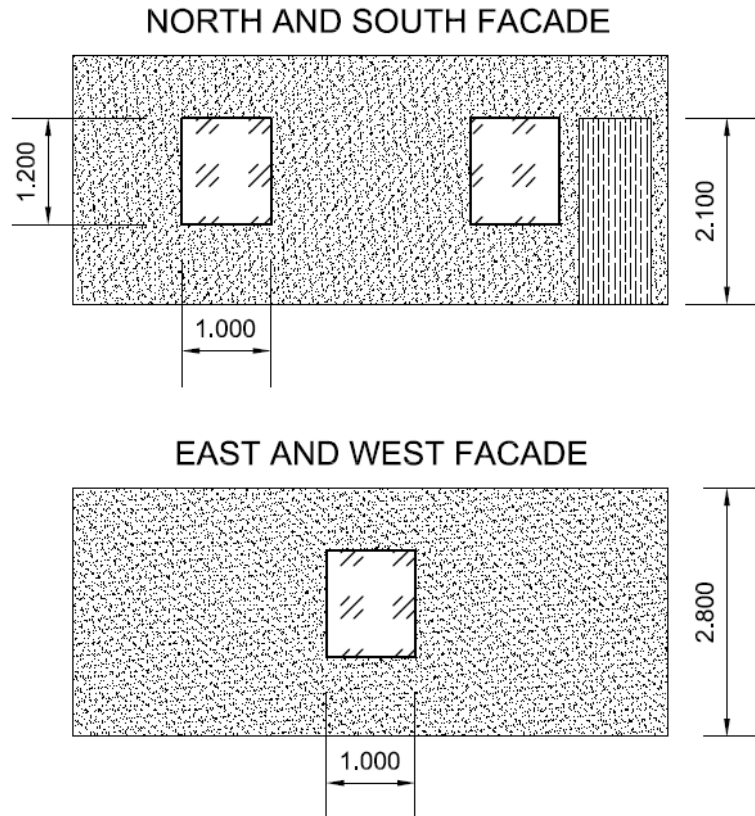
Façade elevations and window dimensions in shoebox model.
